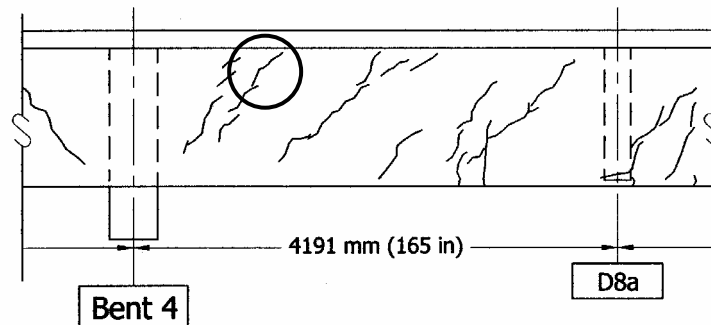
Cracks in the exterior girder between Bent 4 and the first diaphragm
